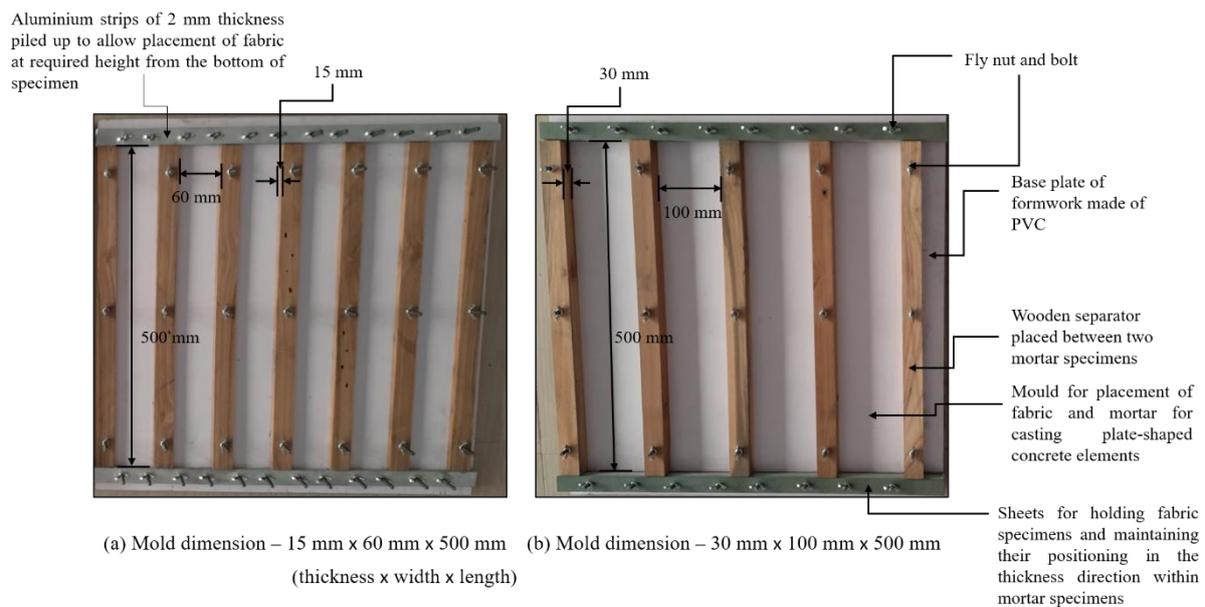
Fabricated moulds for casting FRCM specimens for investigating: (a) tensile and pull-out behaviour, (b) flexural behaviour.
